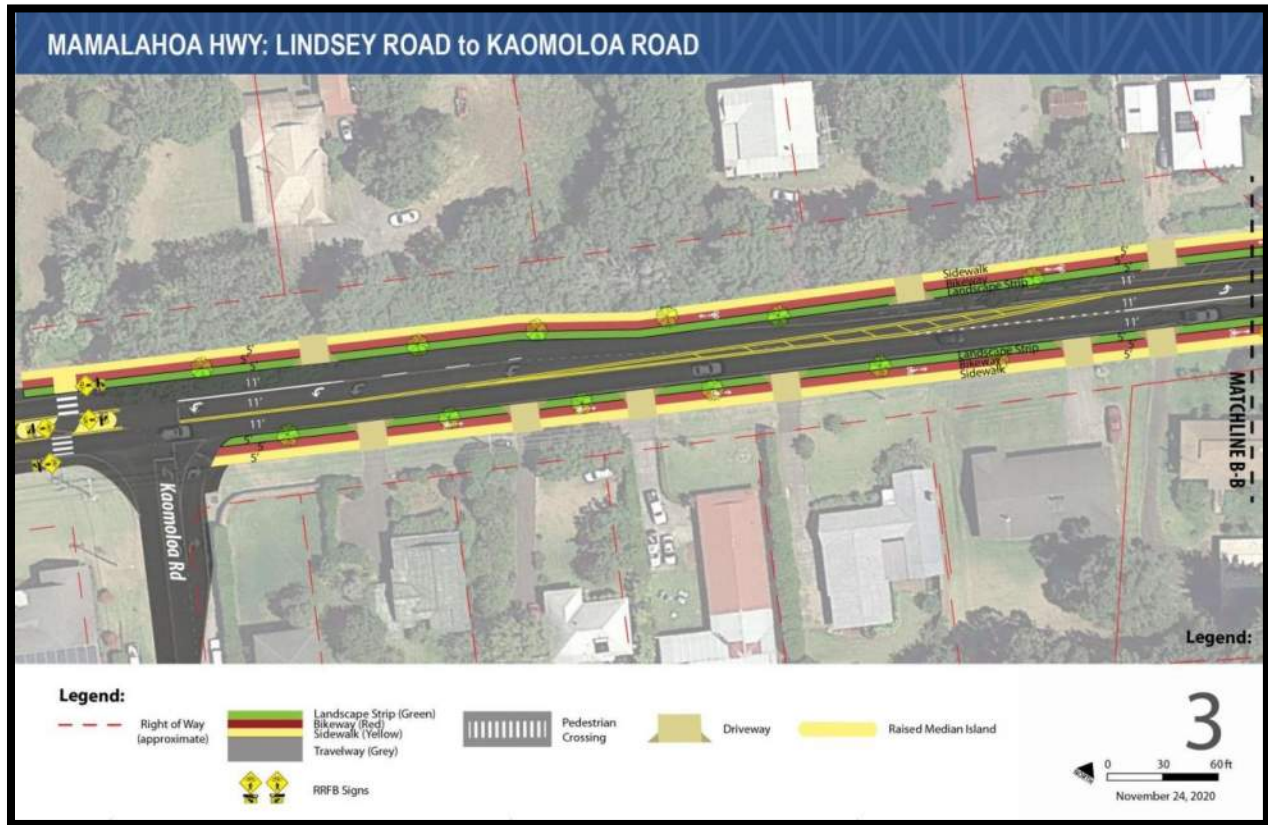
Conceptual Plan for Improvements to Mamalahoa Highway Between Kaomoloa Road and Lindsey Road (3 of 3)
